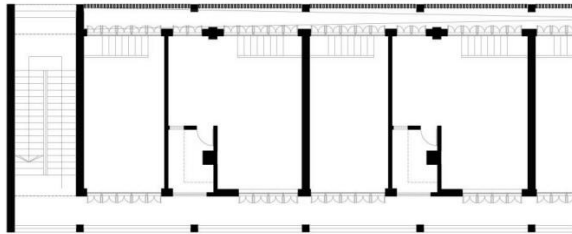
Enlarged Plan of Dwelling Units (Ground Floor) of Building No. 75
